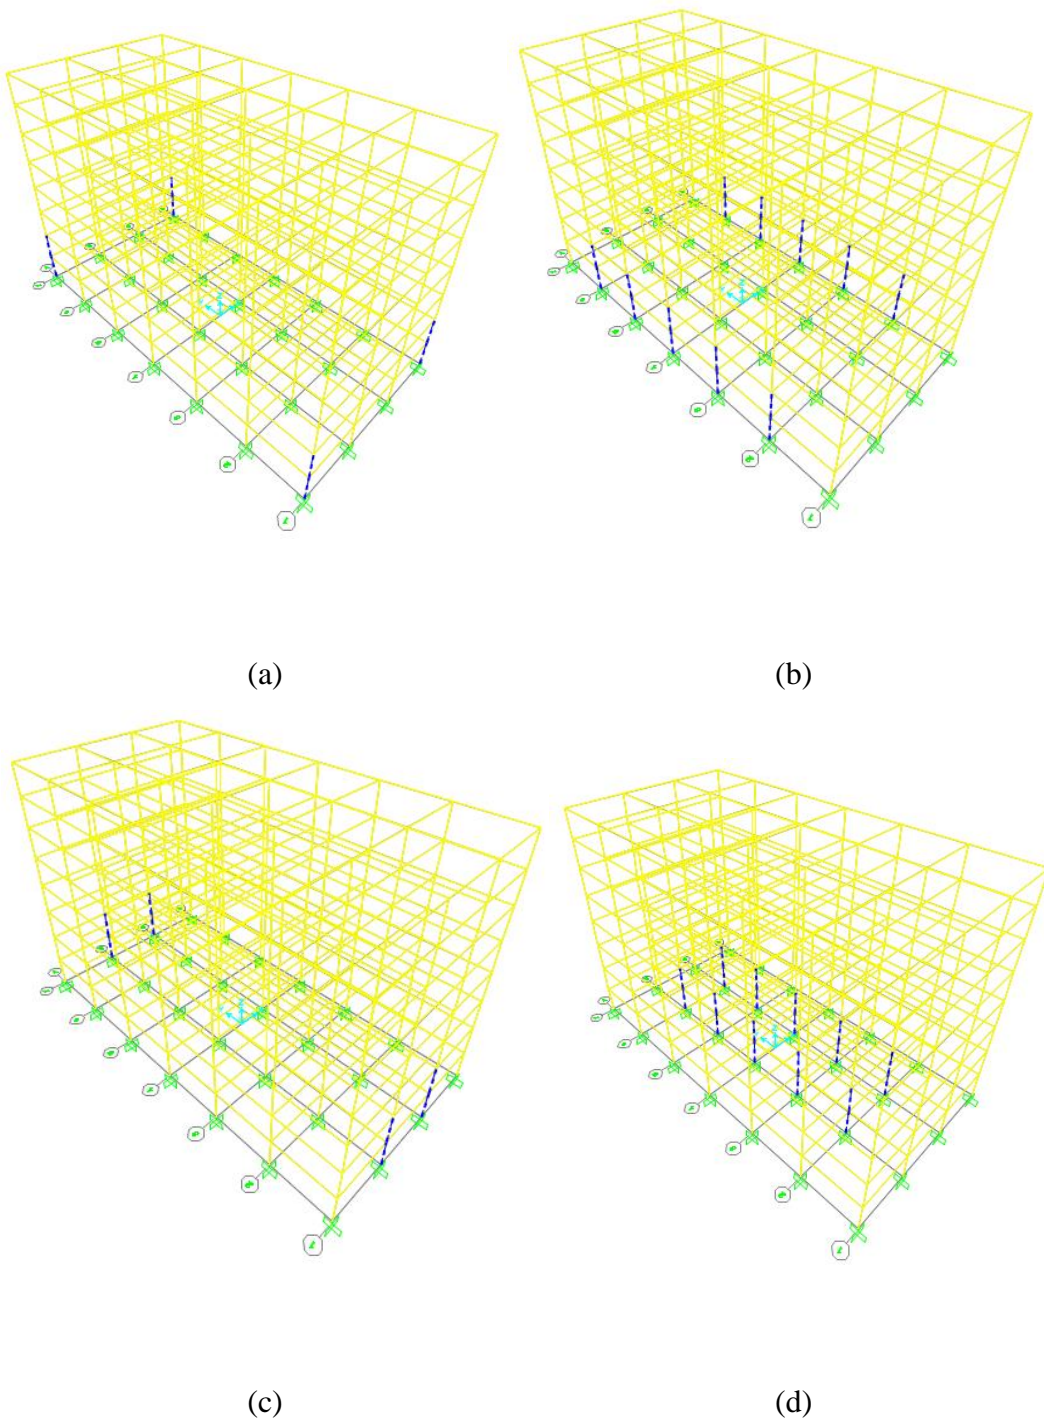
The column member groups in the first two stories of the 584-member steel frame: (a) corner columns, (b) outer y-side columns, (c) outer x-side columns, (d) inner columns.
